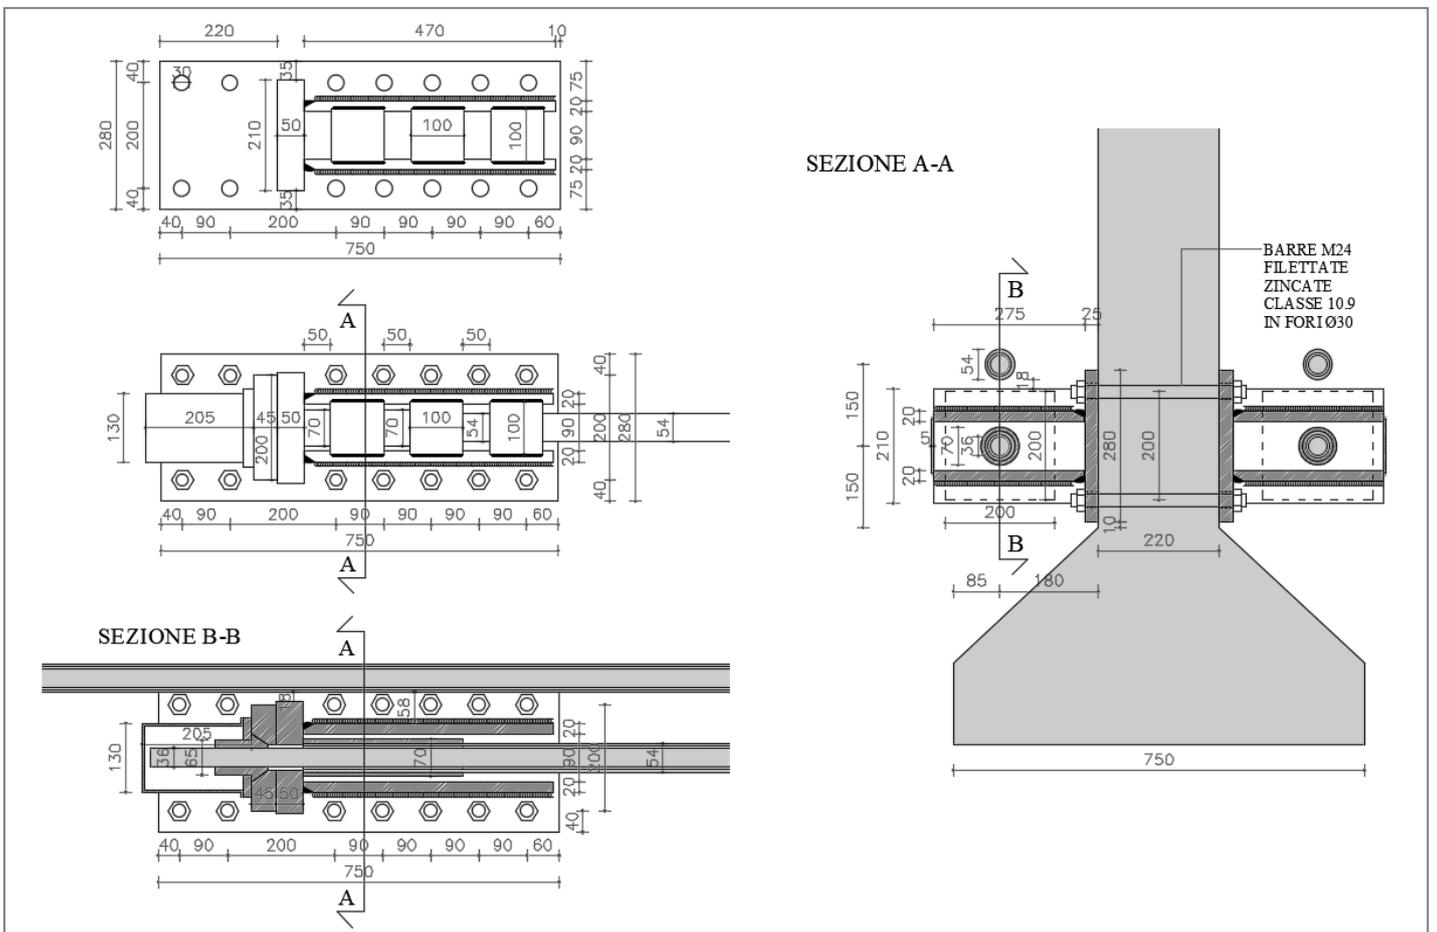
External prestressing bars' anchorage / Ancoraggio della barra di precompressione esterna.
